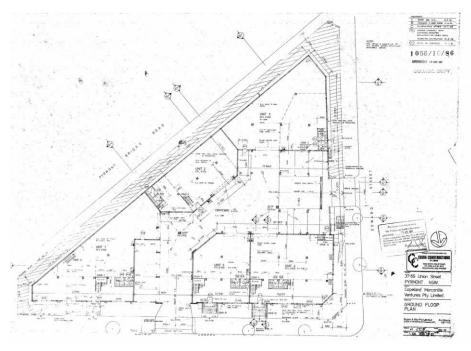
1986 – Ground floor plan prepared by Butler & Sky Pty Ltd, architects, dated May 1986, for 37-69 Union Street, as amended, approved on 10 April 1987 (Source: City of Sydney Archives, BA 86/1056, '37 - 61 63 - 65 67 & 69 Union St Pyrmont - Construct New Office Warehouse Building \$1800000 22 05 86 Cedra Construction Pty Ltd (22/05/1986 - 14/02/1992).')
